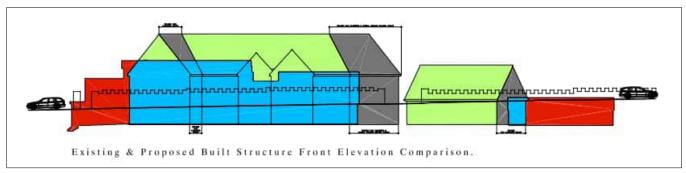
Extract from Built Structure Front Elevation Comparison Plan. Green denotes new height above the existing ridge lines
